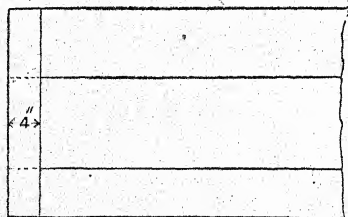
Setting out Lead for Gutter. Fig. 234.—Scribing Gauge.
